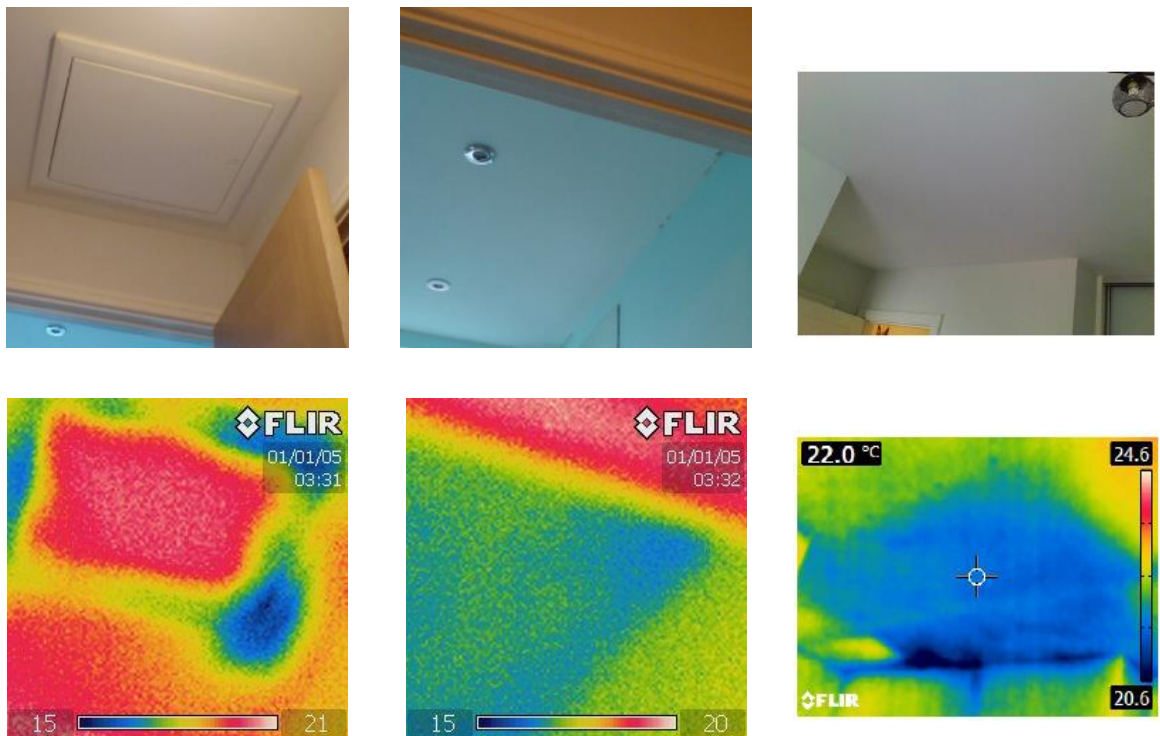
Thermal imaging of the loft hatch (left) and ceiling of the main bathroom (middle) in dwelling H0 taken from the hall on floor 1. Images on right show thermal imaging of the ceiling in the second bedroom in dwelling H7 (Source: House Scan report).
